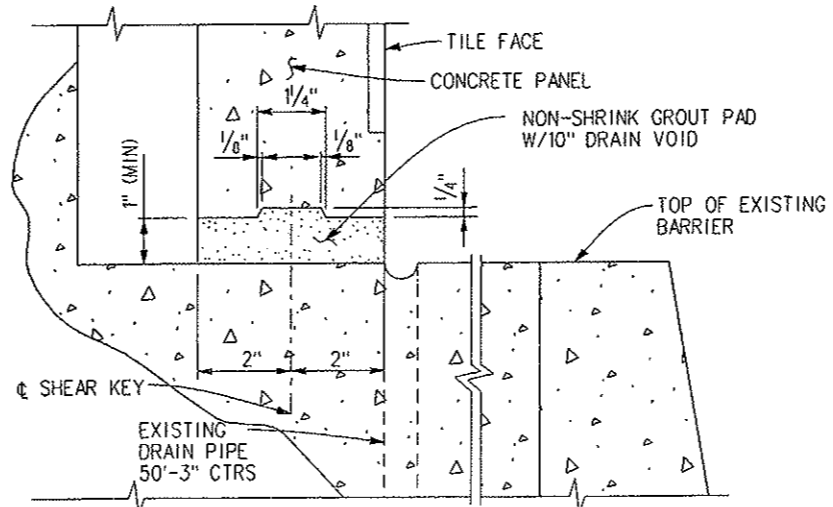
DETAIL AT CONCRETE BLOCK WALLS (PORTAL AND TRANSITION AREAS)
